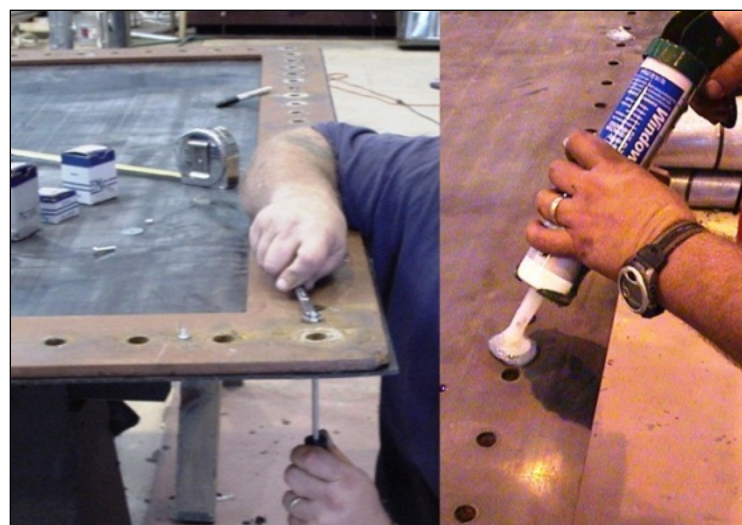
Bolt membrane to steel frame and apply silicone around bolts and washers.
